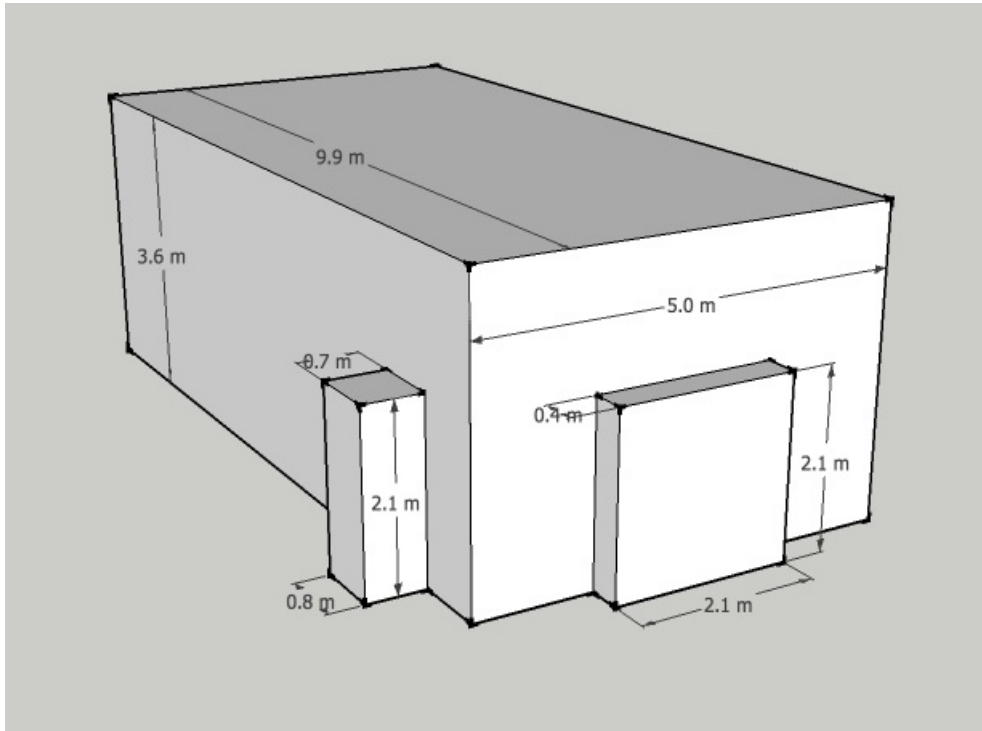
Sketch of the teaching lab (test location) (metrics in meters, m)
